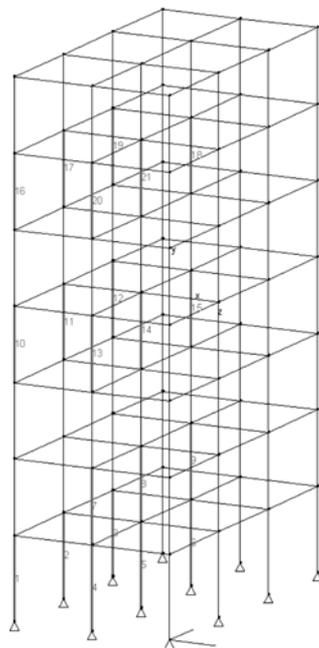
(b) Seven storey space steel frame F' with considered columns
